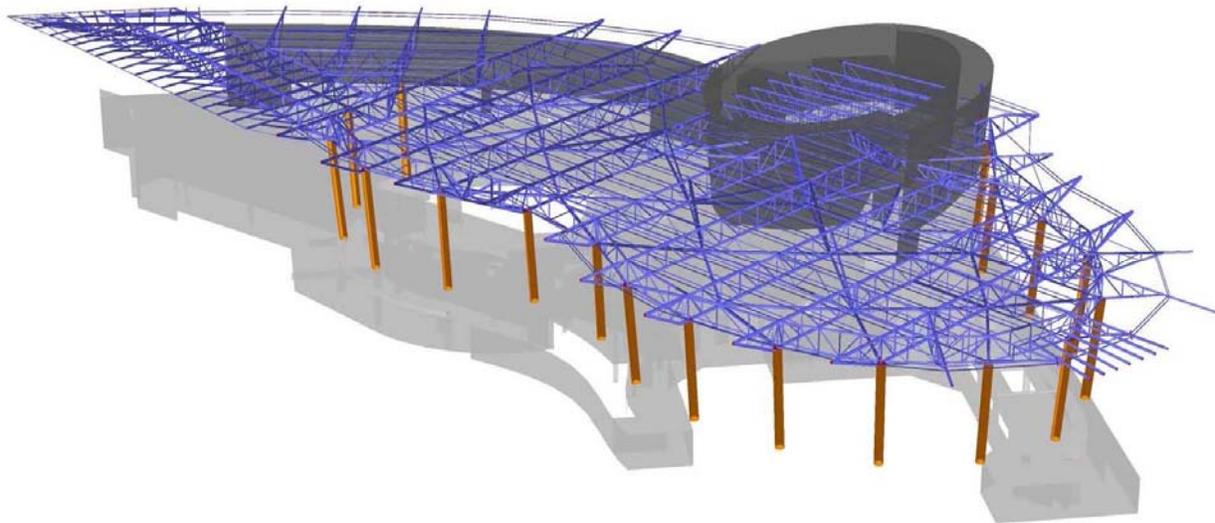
High roof steel truss system supported on timber façade and laterally restrained by the concrete 'Cradle' theater structure.
